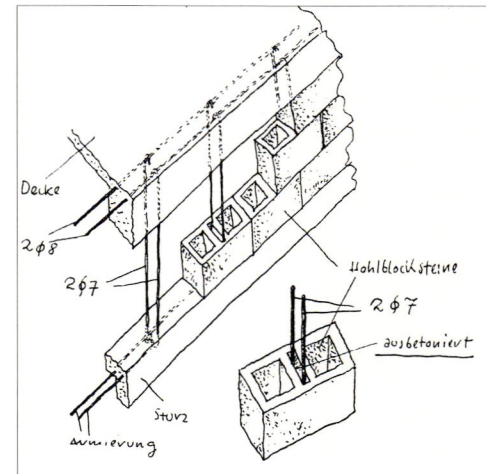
Suspended lintel with reinforced concrete hangers, detail of Weissenhofseidlung construction. Le Corbusier, 1927.
